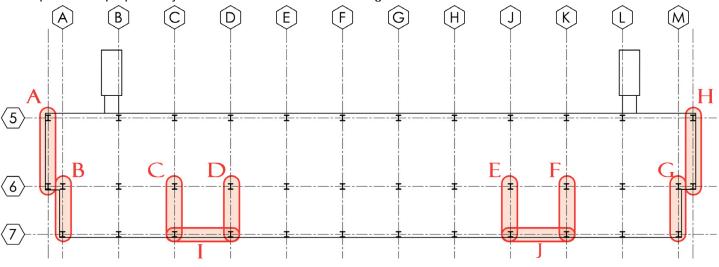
Shown above is the steel framing plan, including braced frames as highlighted
